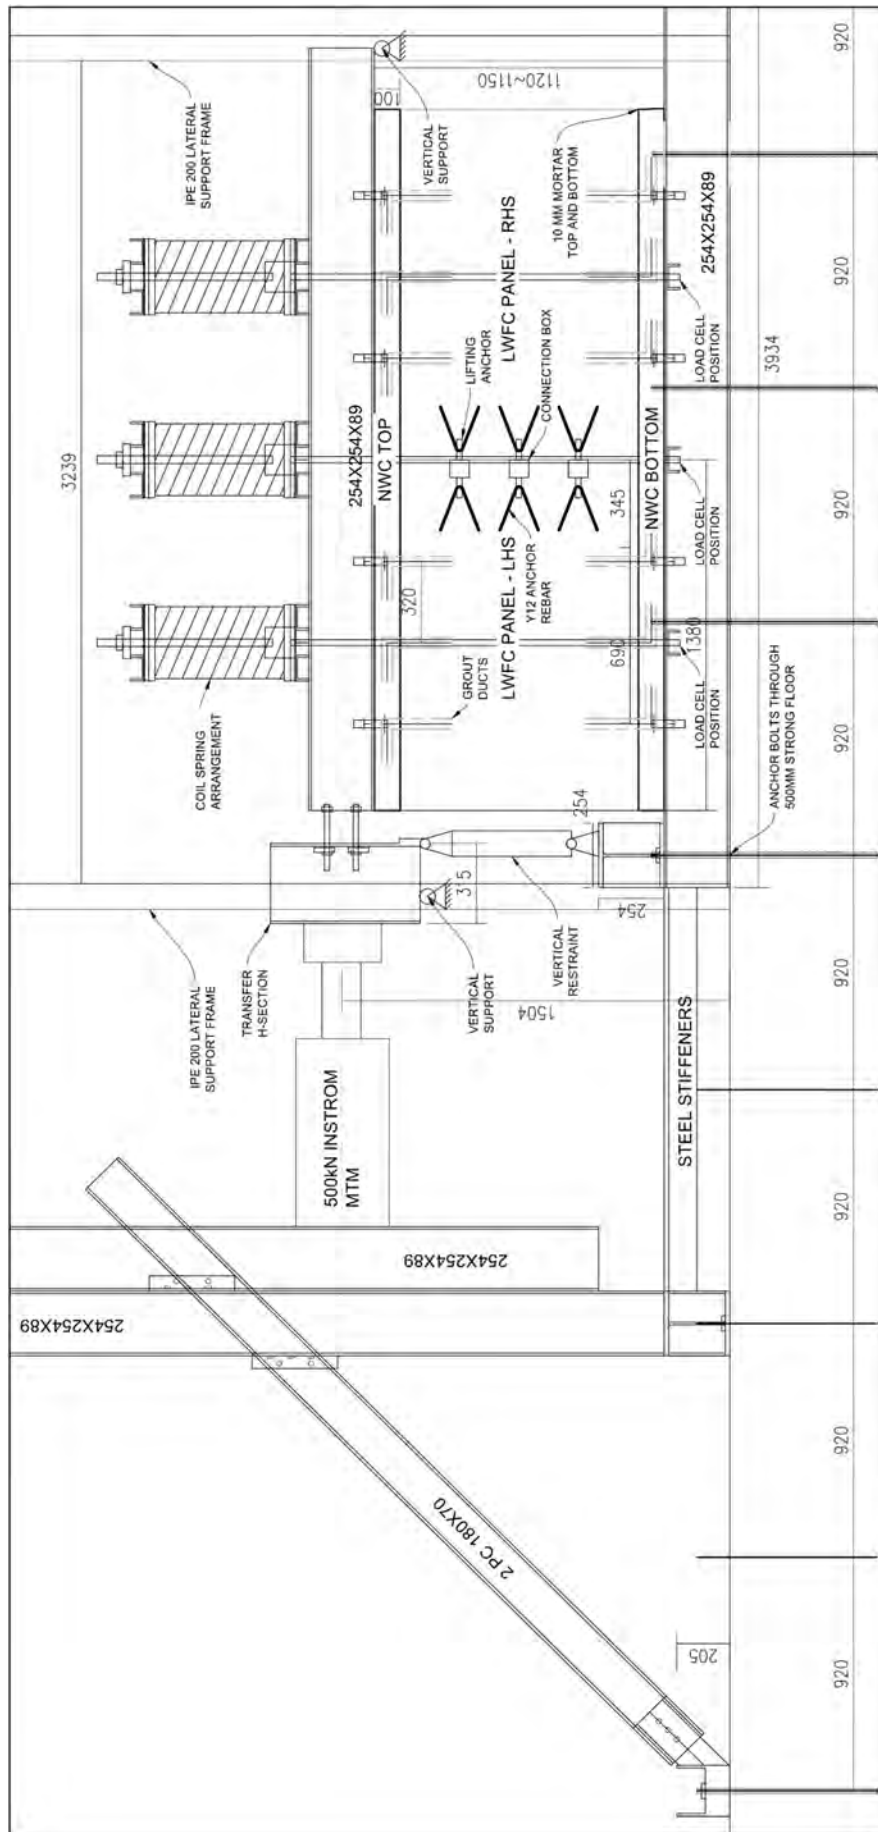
Physical scale test laboratory setup drawing (Units in millimetres).
